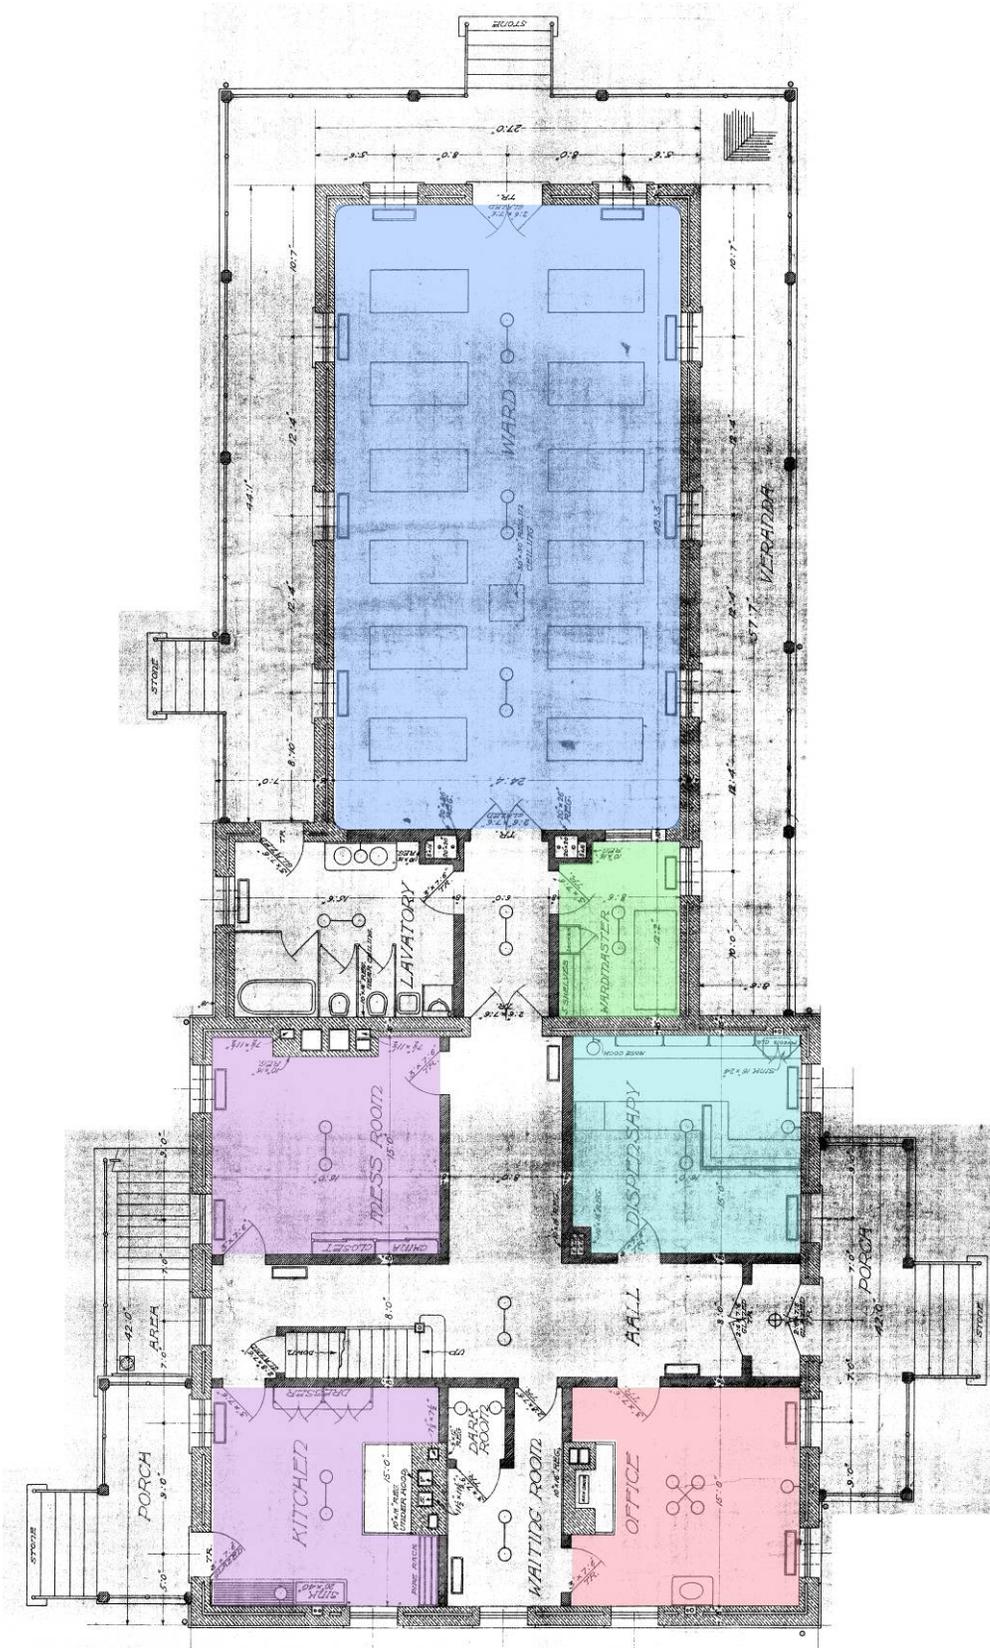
Second Post Hospital, First Floor Plan, Fort Bliss, Texas, circa 1900 (NARA College Park, RG 92 Blueprint Files Fort Bliss, TX).
